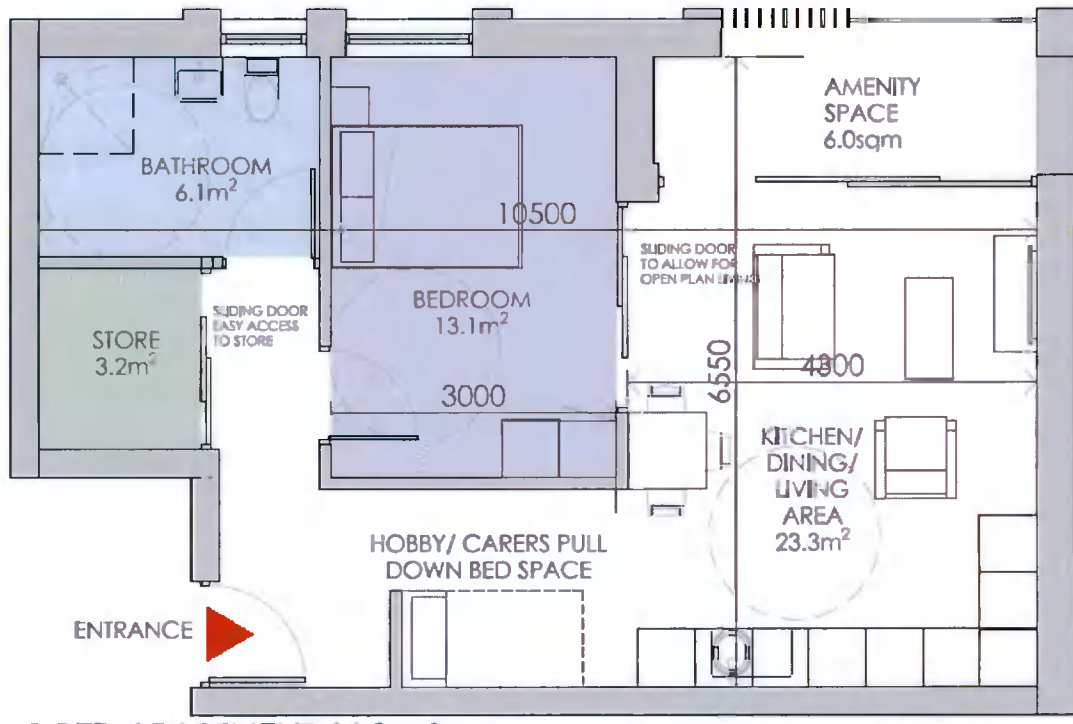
Typical first floor plan of the independent living blocks House Type 7.
